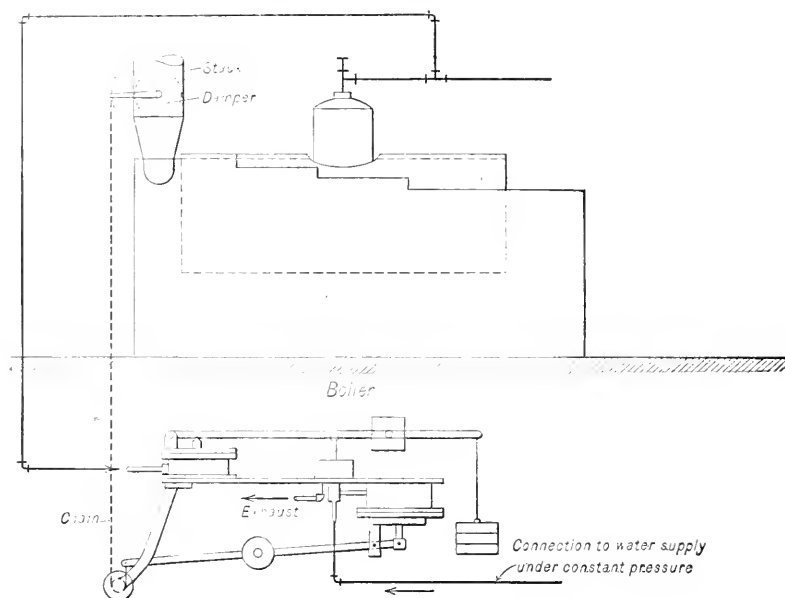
HYDRAULIC DAMPER REGULATOR.
